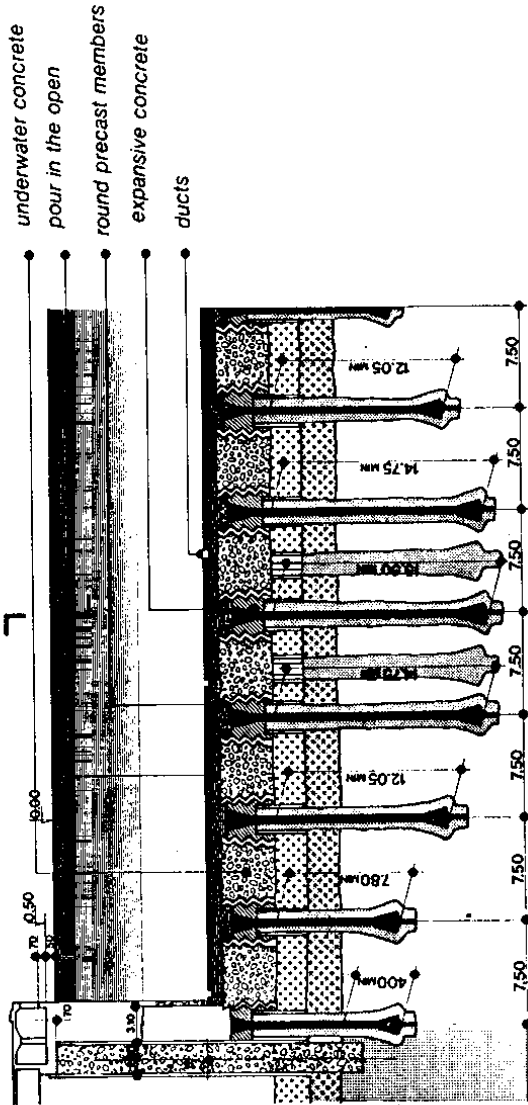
Scheme of a section of the foundation slab with foundation piles
